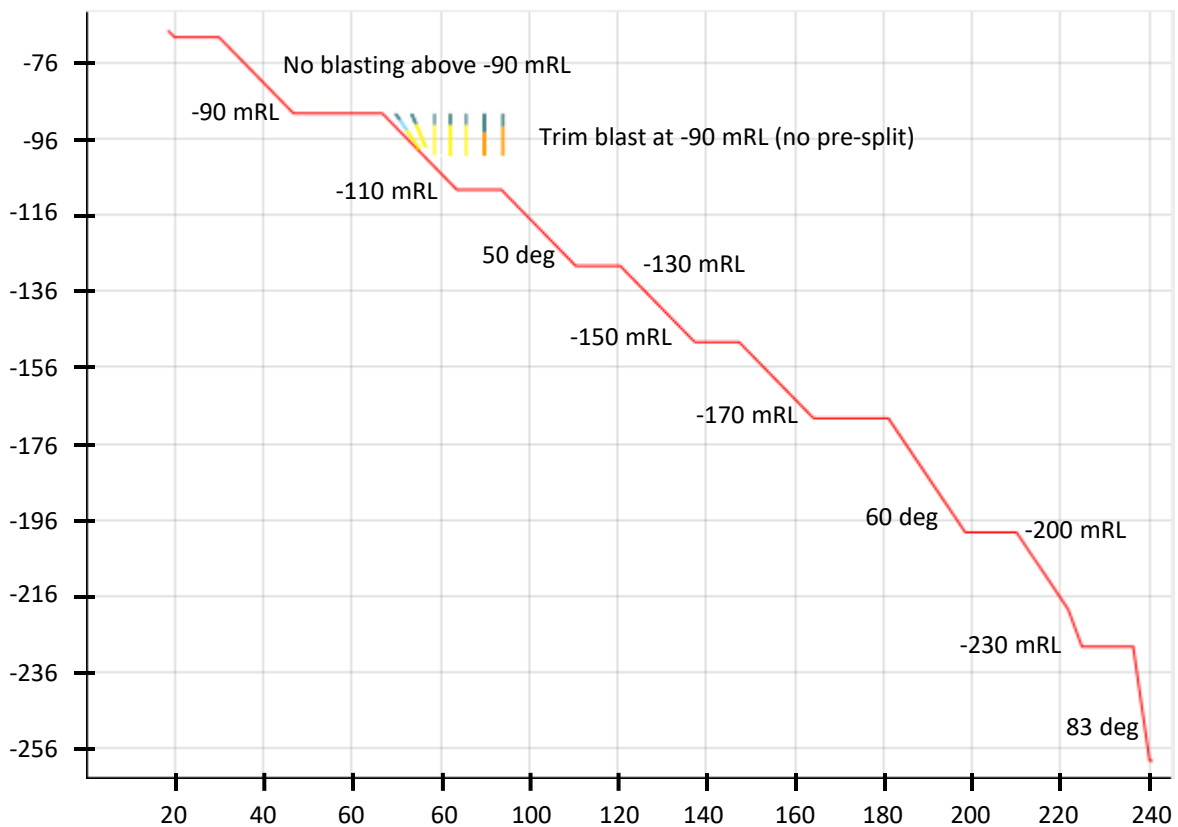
Vertical section through western wall, showing Stage 2 design shell, and bench-face angles down to -260 mRL.
